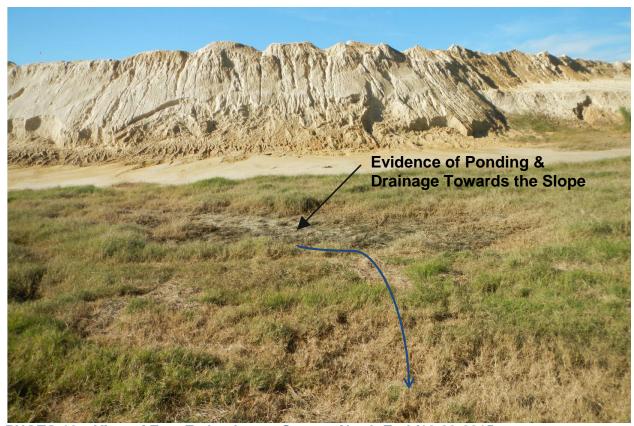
View of East Embankment Crest at North End (12-09-2015
